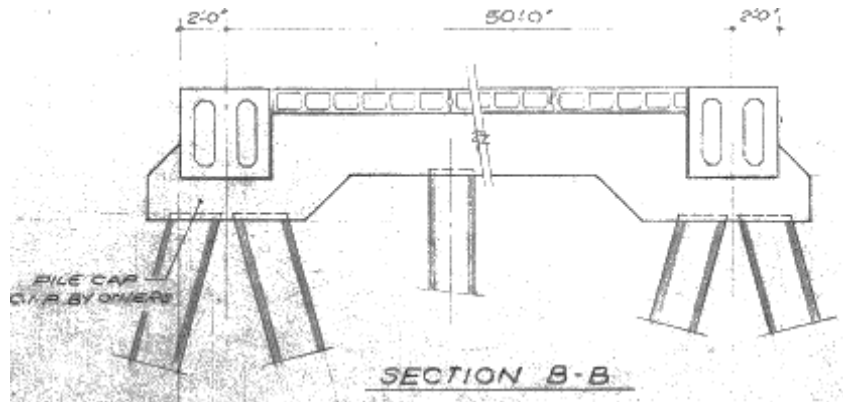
Cross-Section of Dock Superstructure – West End (Con-force DWG 9315-1)
